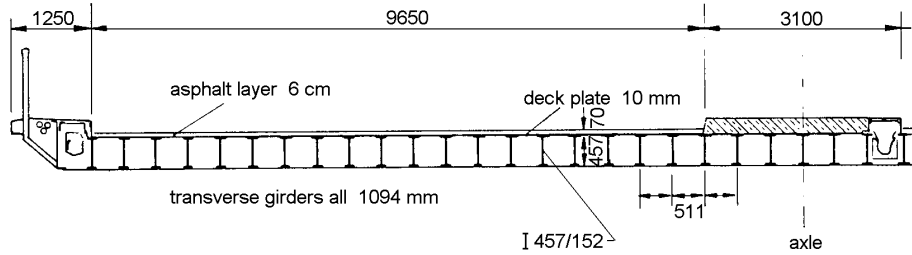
Stiffened steel deck of the highway bridge at Kircheim/Teck (Germany) built in [Schachterle and Leonhardt, 1936].
